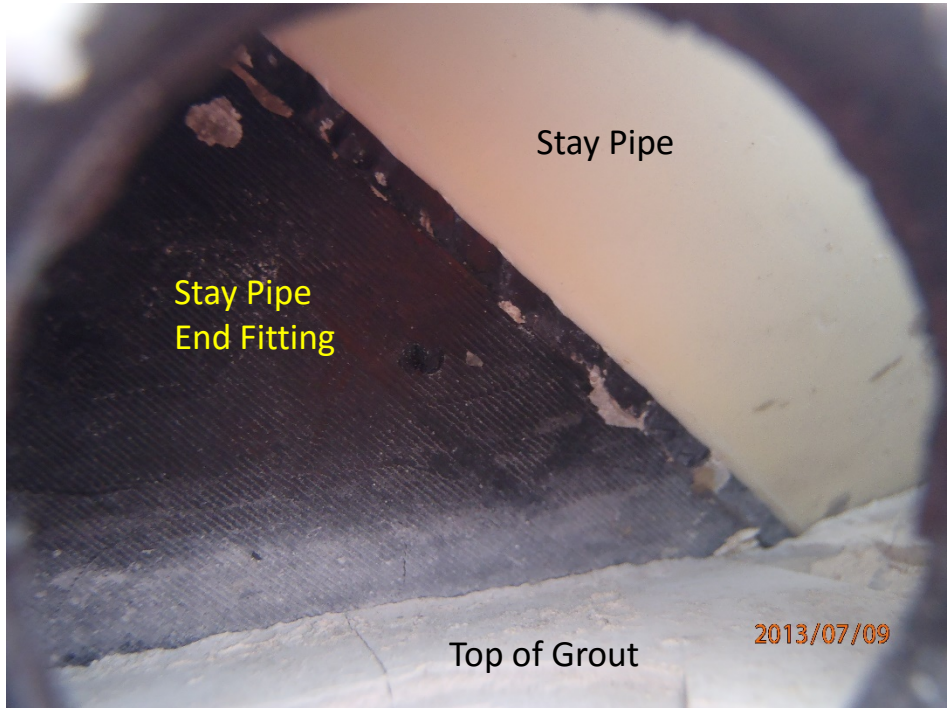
View from Hole Cut in Connection Sleeve Pipe. Grout Void Area Showing Stay Pipe End Fitting Embedded in Top of Grout.
